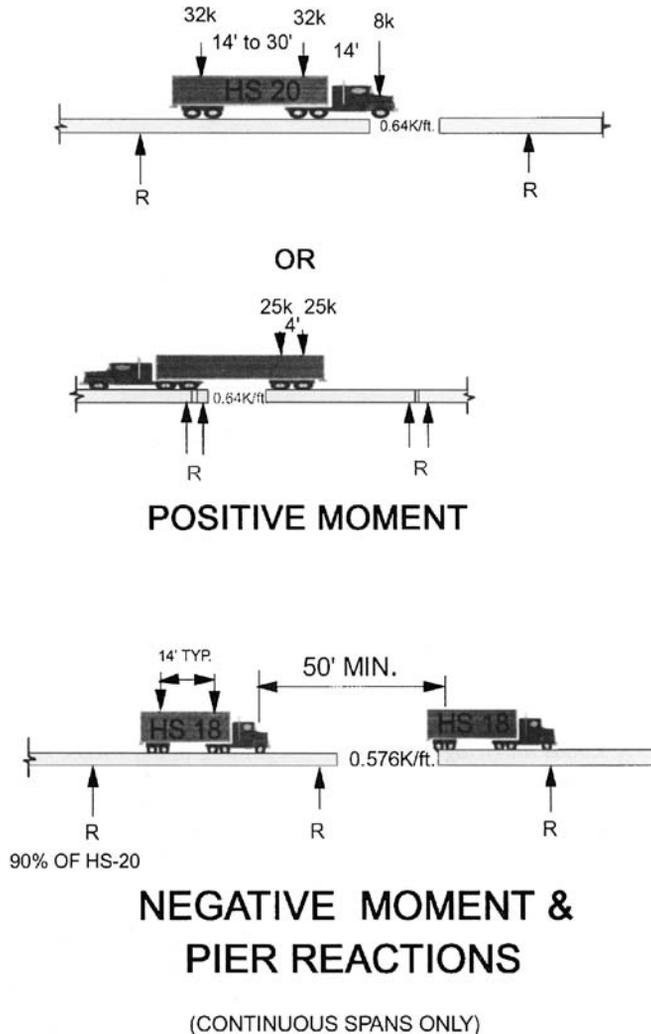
Loadings for maximum moment and reaction for LRFD design of highway bridges.
